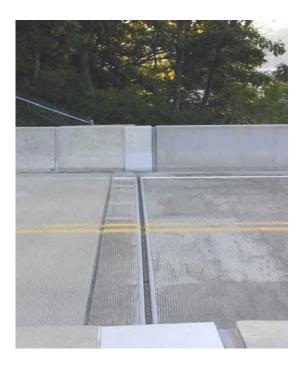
Strip Seal at North Abutment (typ.) – note minor debris accumulation
